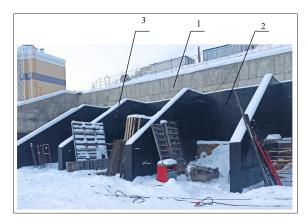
Monolithic reinforced concrete corner retaining wall with buttresses as a retaining recessed building structure of a deformed retaining wall: 1 - existing monolithic reinforced concrete corner retaining wall: 2 - monolithic reinforced concrete corner retaining wall with buttresses 3
